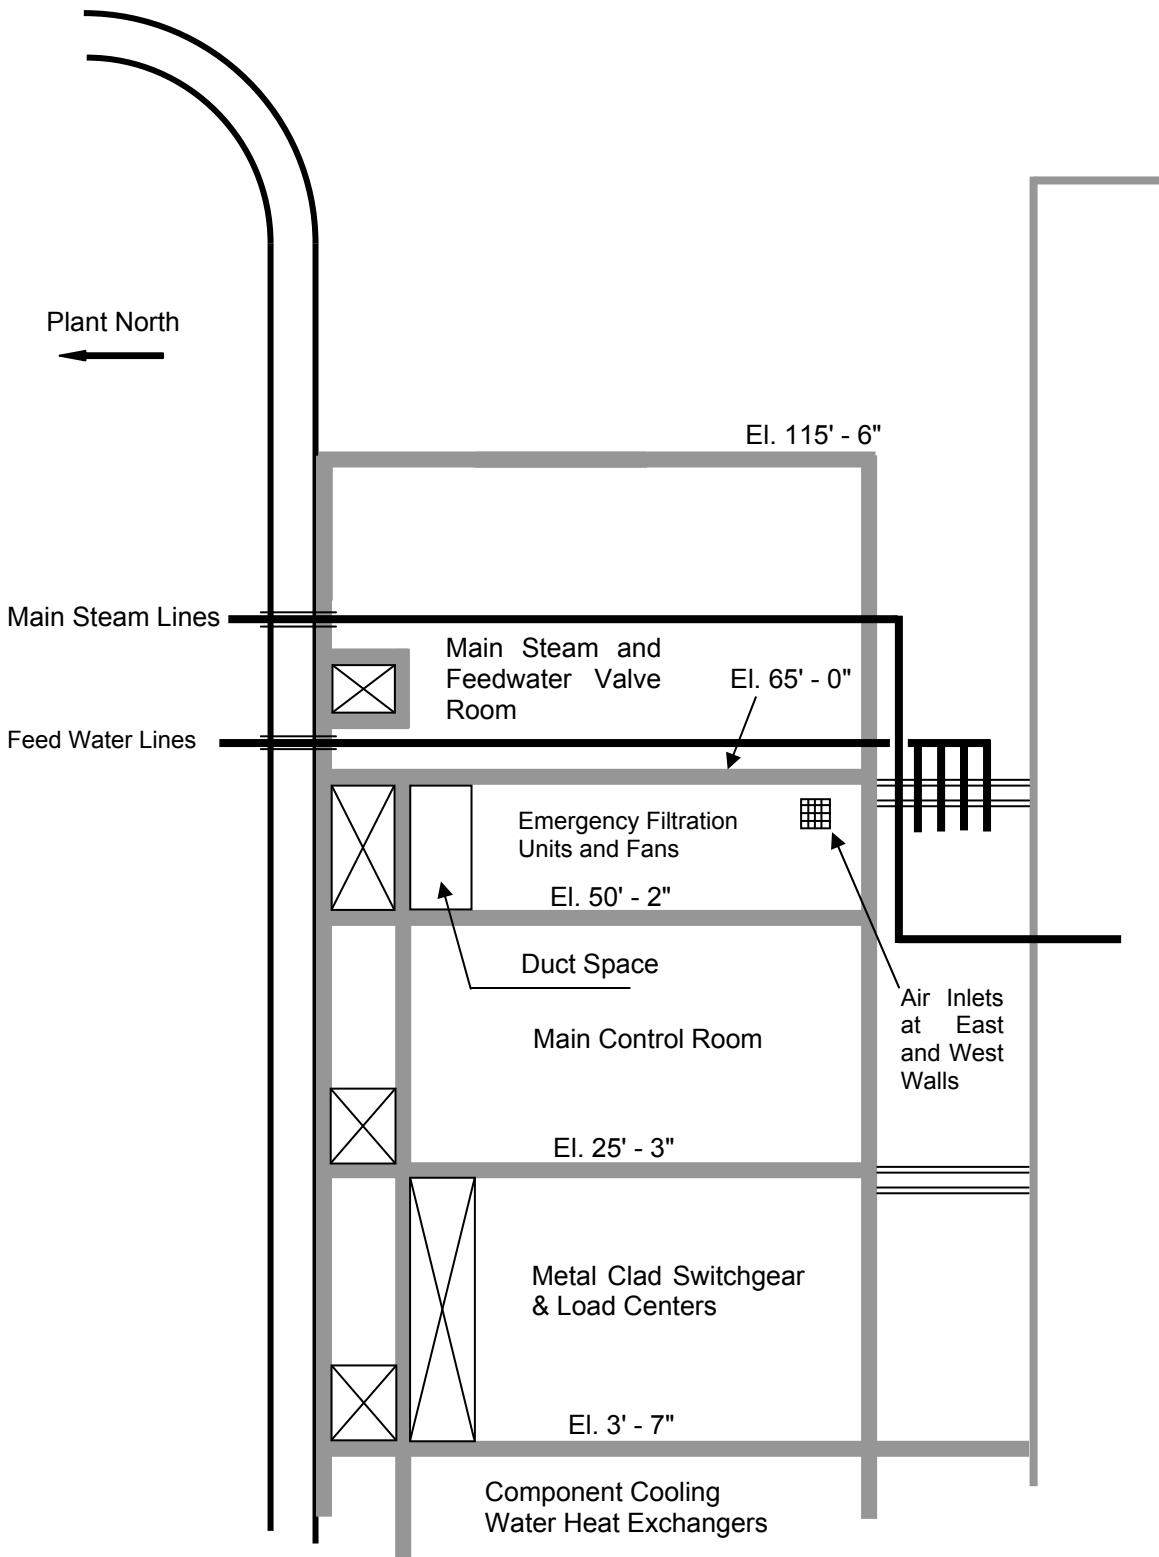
Emergency Control Room Envelope Ventilation System Plan View
